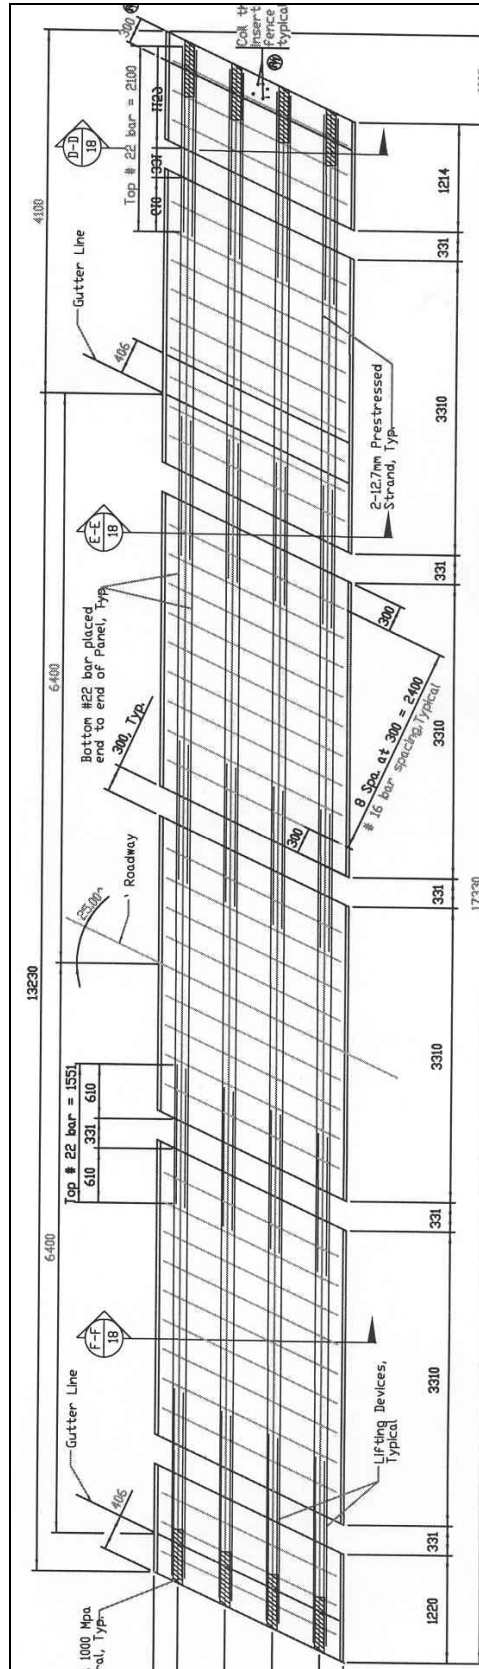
Typical NU-Deck panel plan view (NDOR, 2002)
